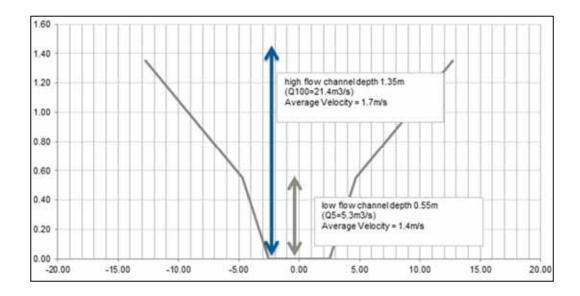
Conceptual cross section for temporary creek diversion 1
